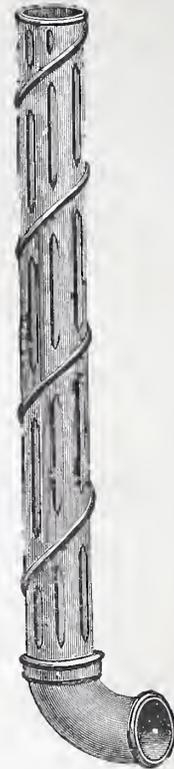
Cast Iron Conductor Bottom, Adapted to the Style of Ritchie's Spiral Pipe.
